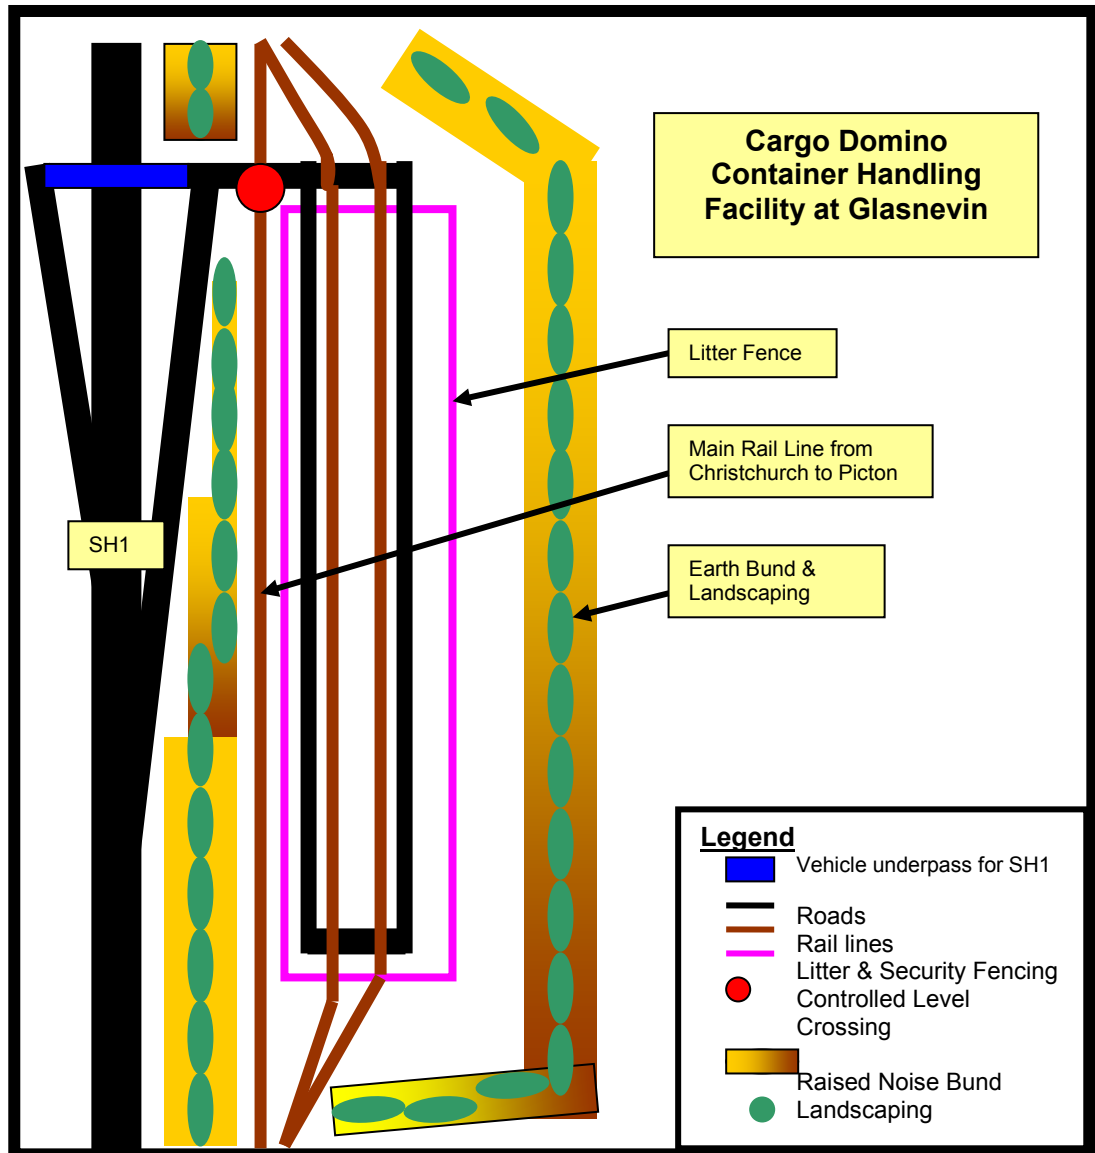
Proposed Layout of the Cargo Domino Rail and Container Handling Facility layout at Glasnevin (Author, 2005).
